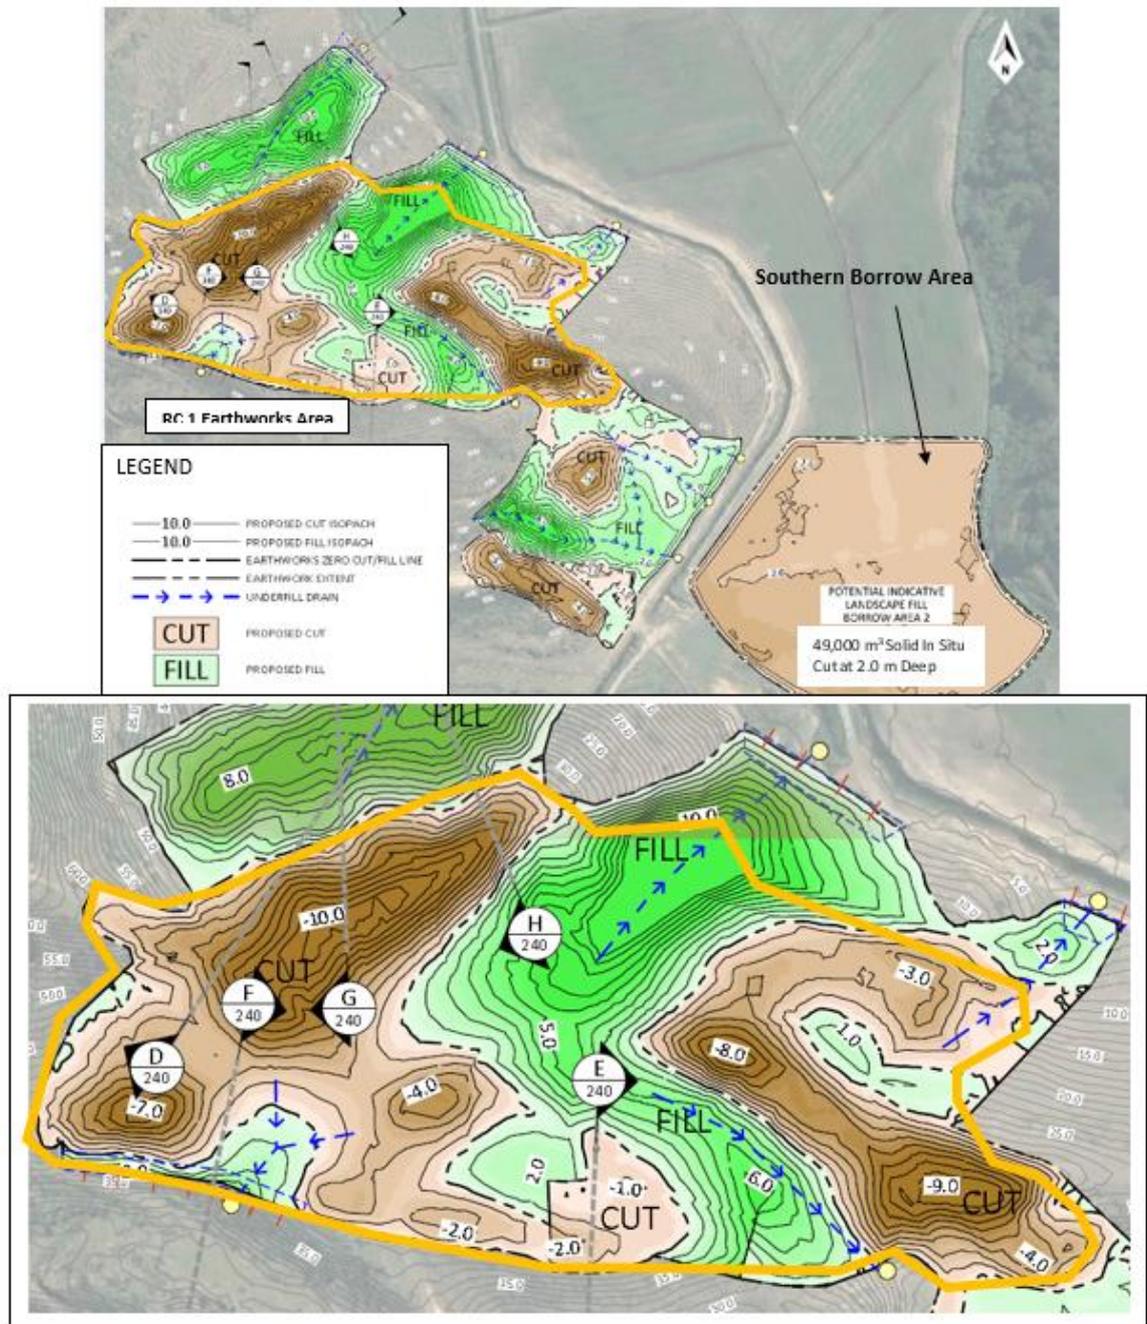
Cut fill plan showing RC 1 and Southern Borrow Area in RC2 with the area where preliminary earthworks must be monitored by an archaeologist outlined in light orange with detail shown in lower plan (source: Civil Plan Consultants Ltd)
